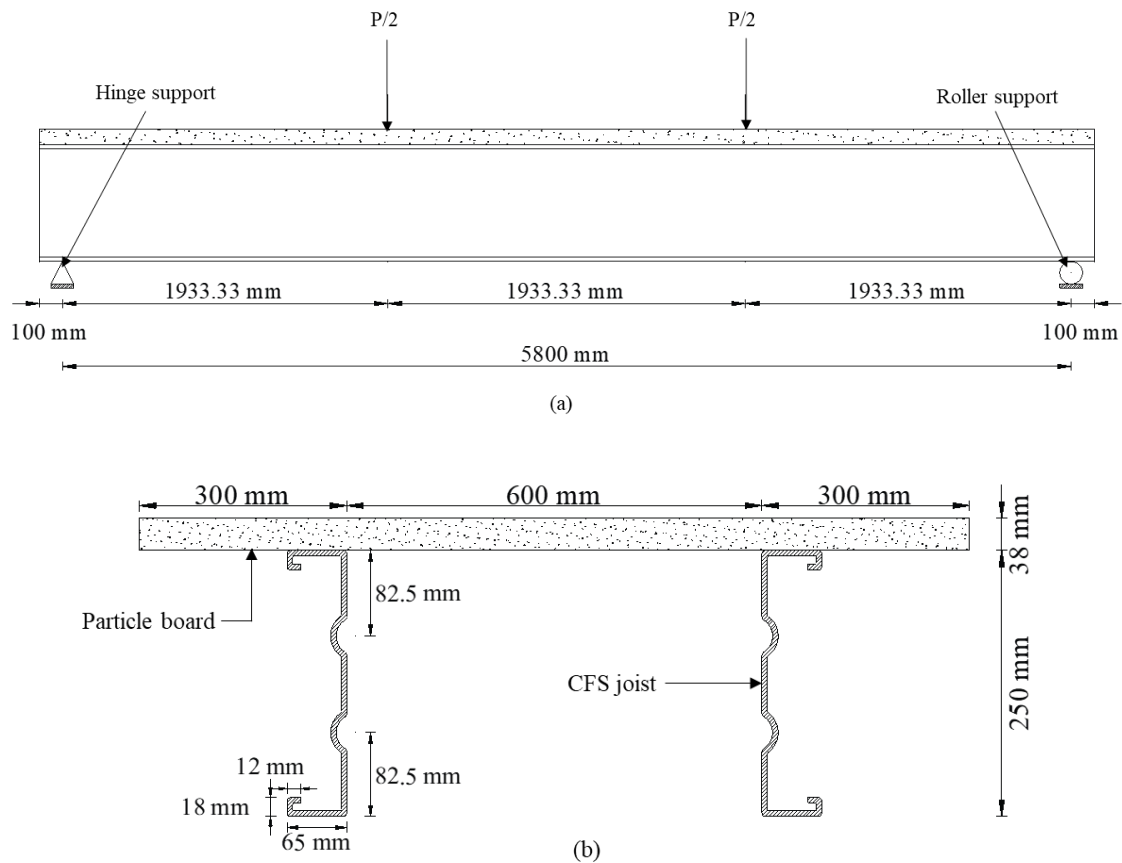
Geometry and dimensions of tested composite floors (a) Longitudinal, (b) Cross-section.
